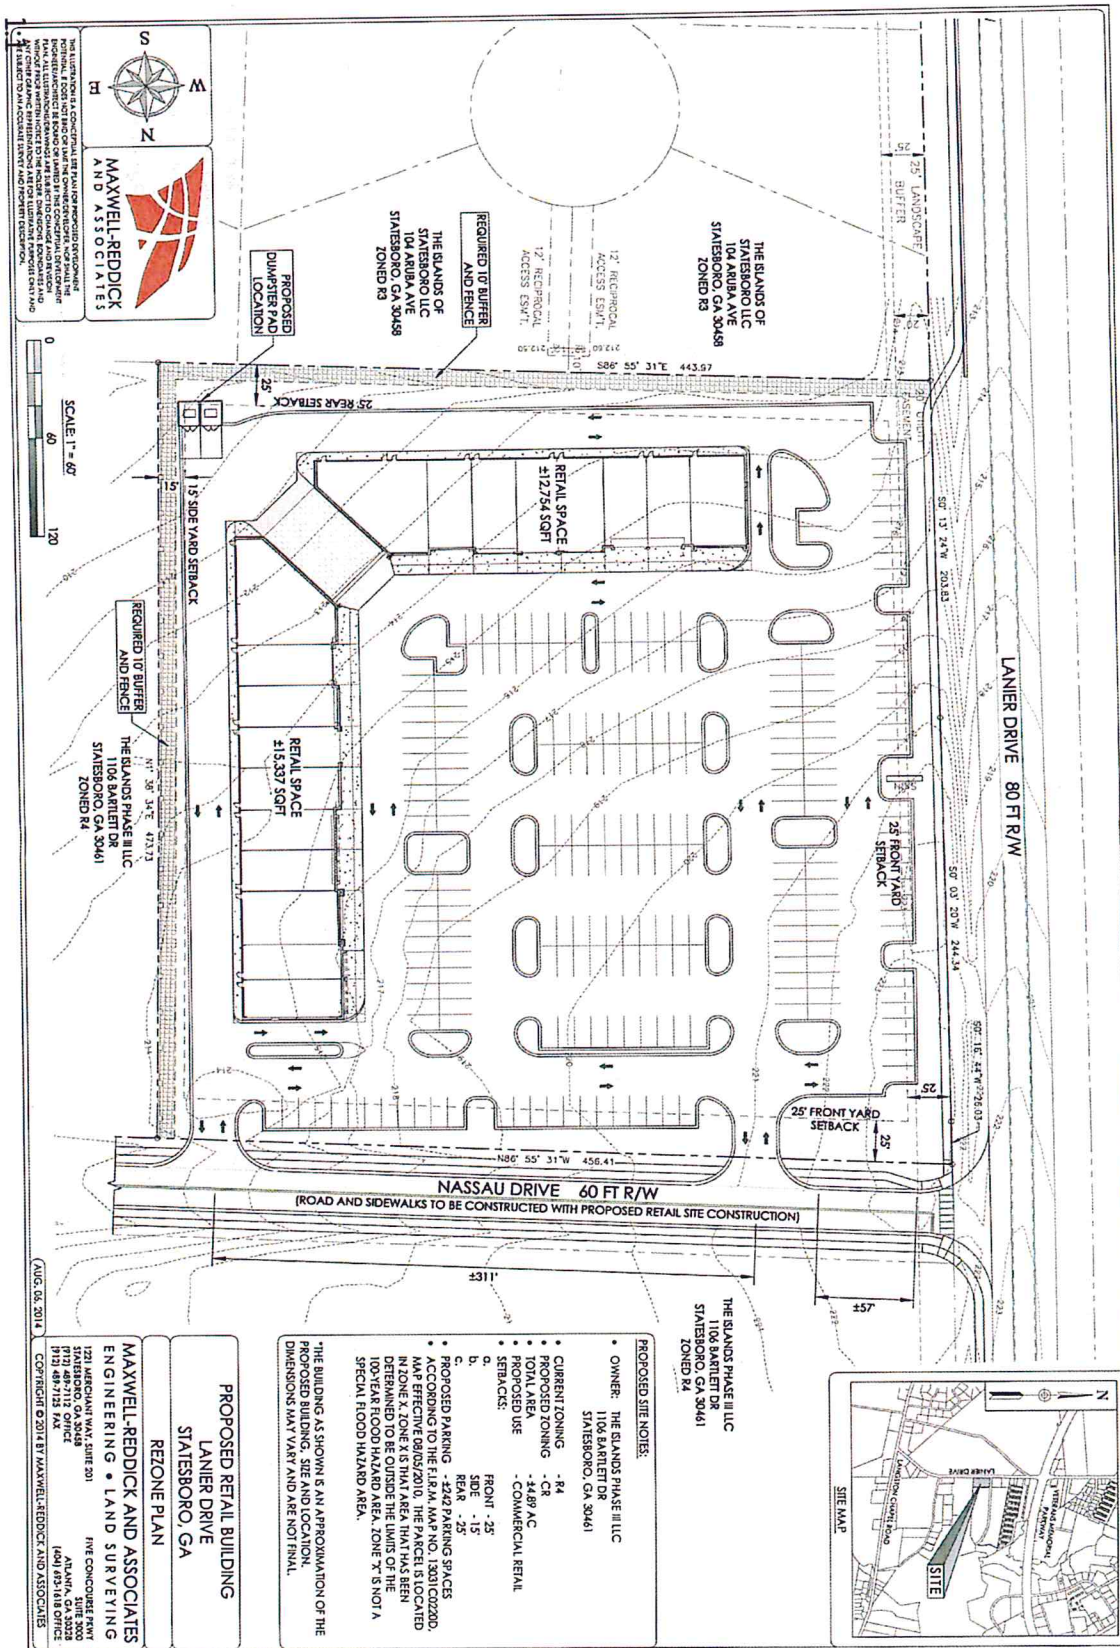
EXHIBIT B: CONCEPTUAL SITE PLANS CONT'D
